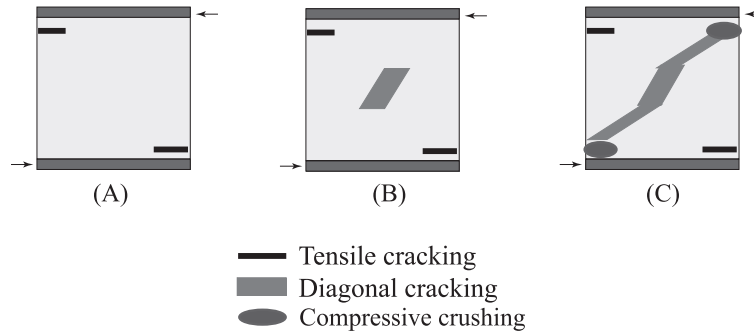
Shear test on a full wall – cracking stages observed in experiments by Raijmakers and Vermeltfoort (1992)
